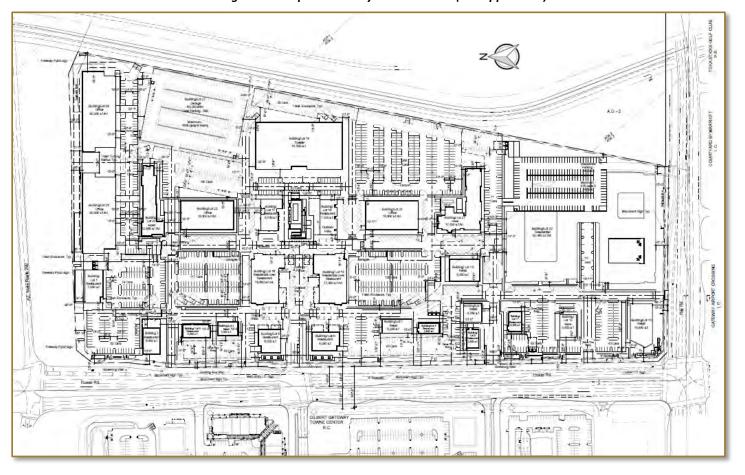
Proposed Gallery Park Site Plan (see Appendix 3)
